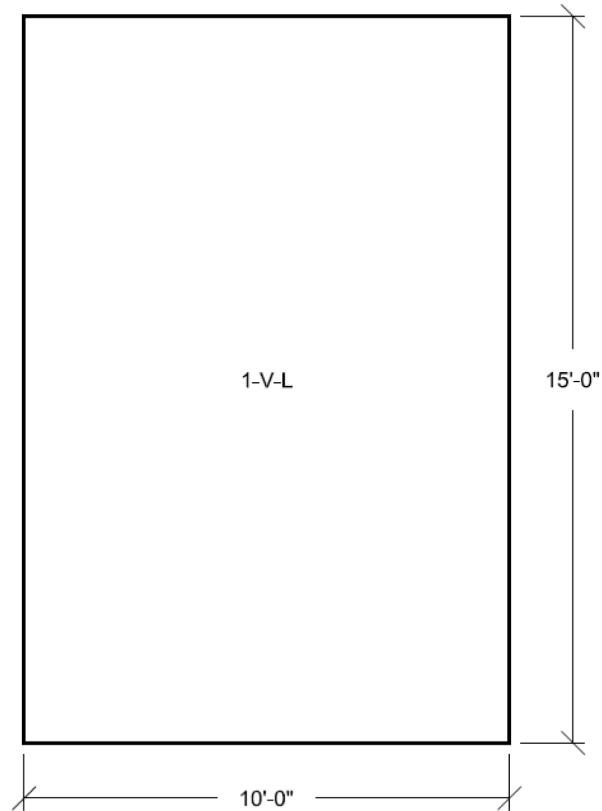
H.6-204 DGFOSV Wall 16 Looking From Outside
